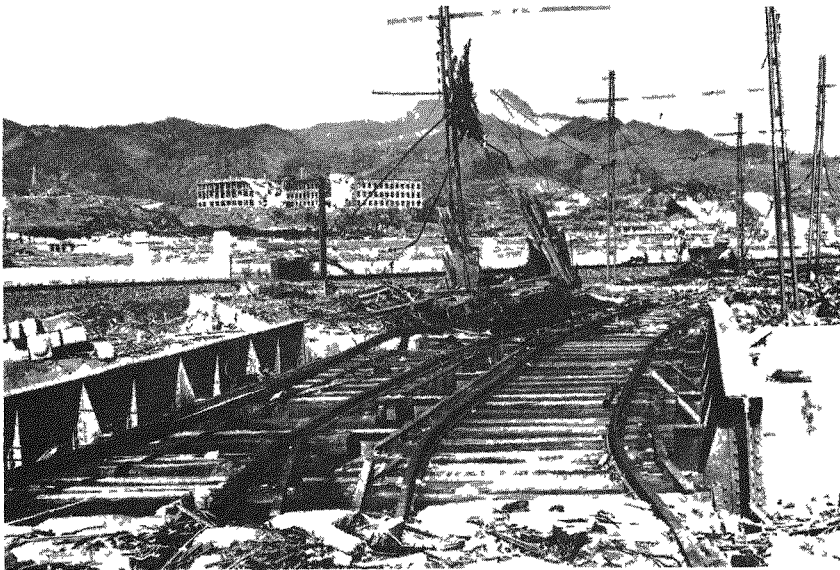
A steel-plate girder, double-track railway bridge (0.16 mile from ground zero at Nagasaki). The plate girders were moved about 3 feet by the blast; the railroad tracks were bent out of shape and trolley cars were demolished, but the poles were left standing.
